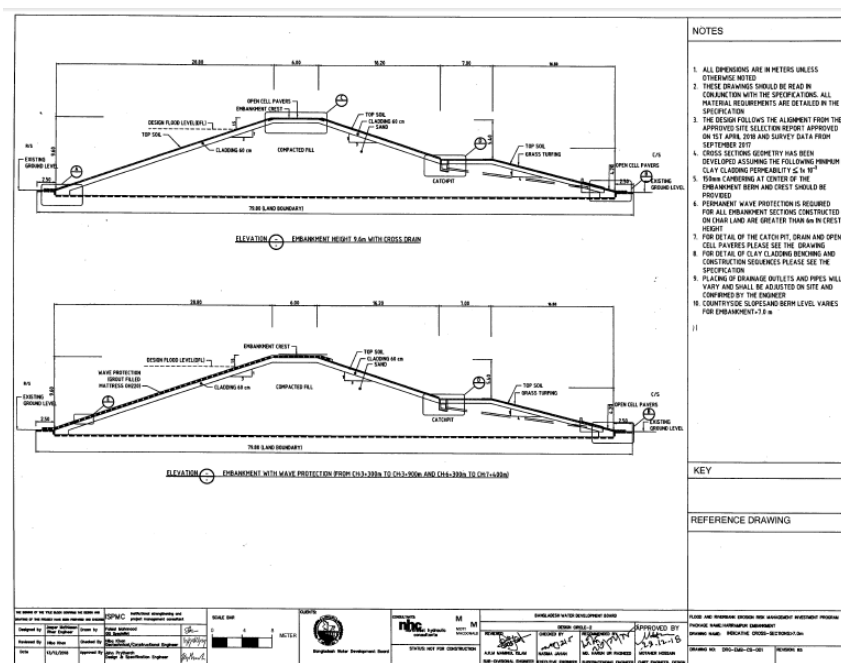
Typical Design section of the proposed Flood Control Embankment to be constructed along Left Bank of the Padma River in Harirampur (Source: BWDB).
